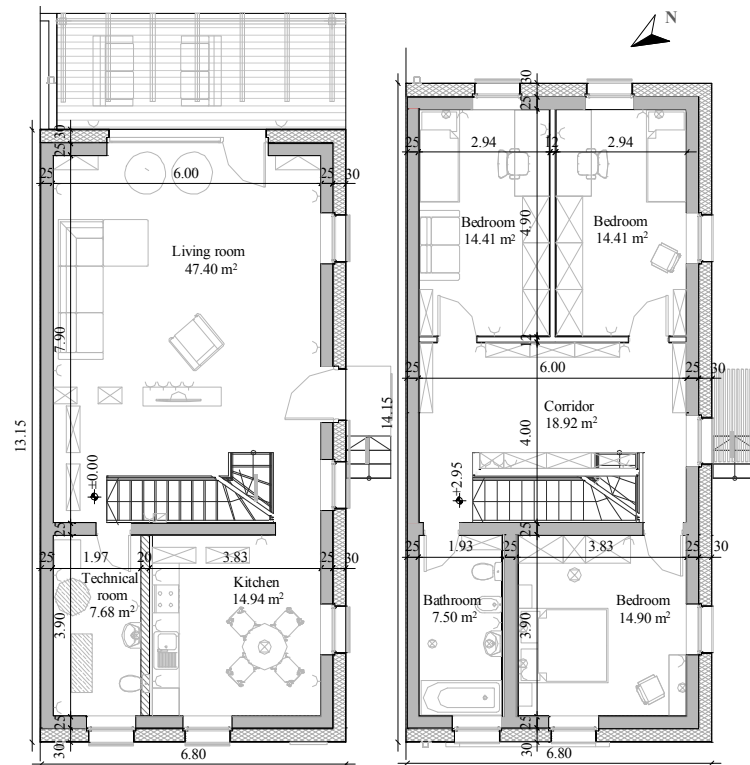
Horizontal architectural plans for the studied house (ground floor, first floor)
